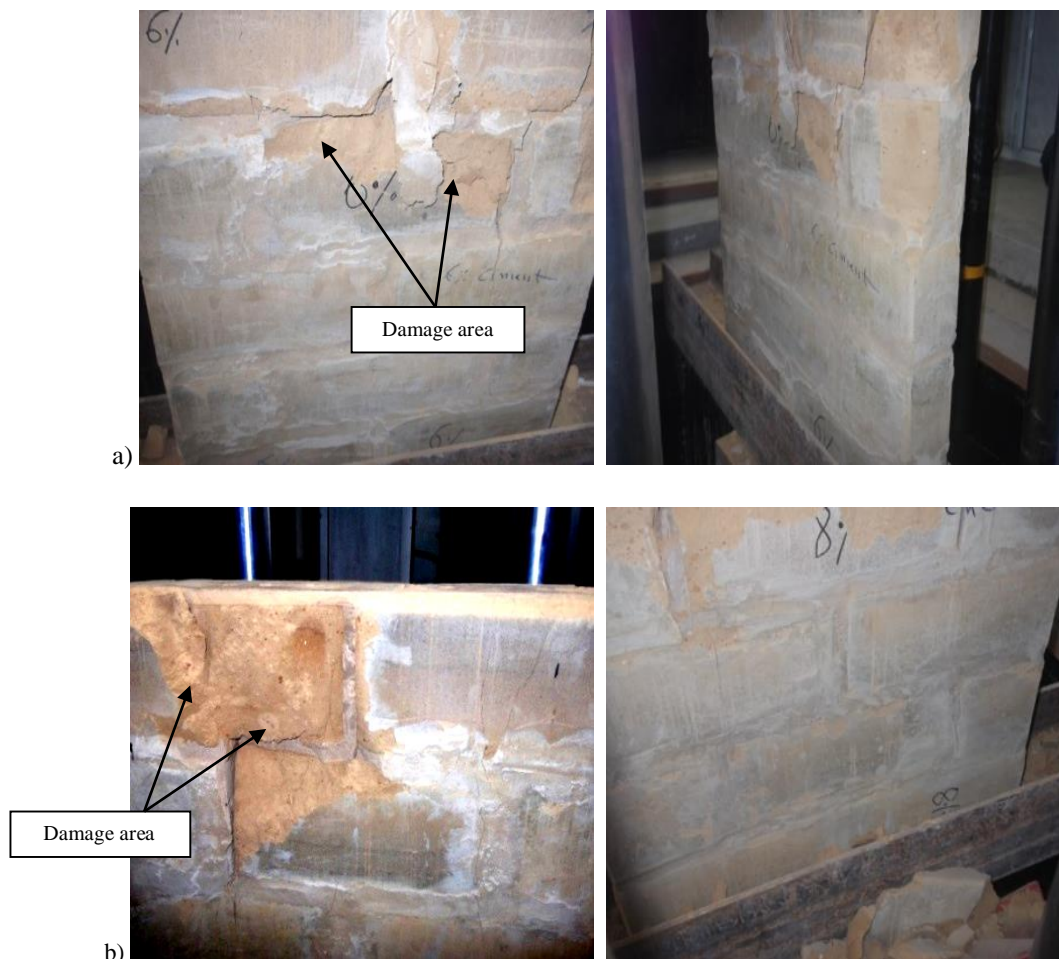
Typical failure mode of mortar bound CSEB masonry walls under uniaxial compression, stabilized with 6 % (a) and 8 % (b) of cement.
